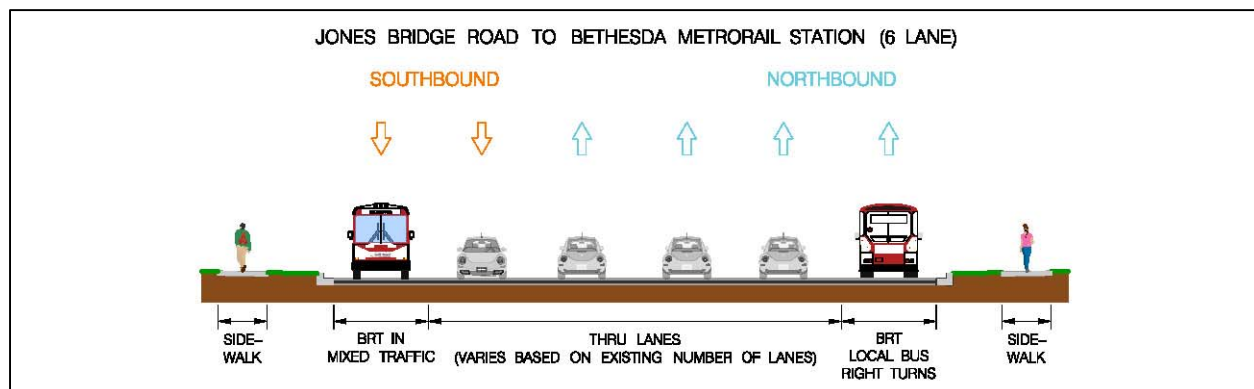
Alternative 4C - Section 1: PM Peak Period – Jones Bridge Road to Bethesda Metrorail Station
